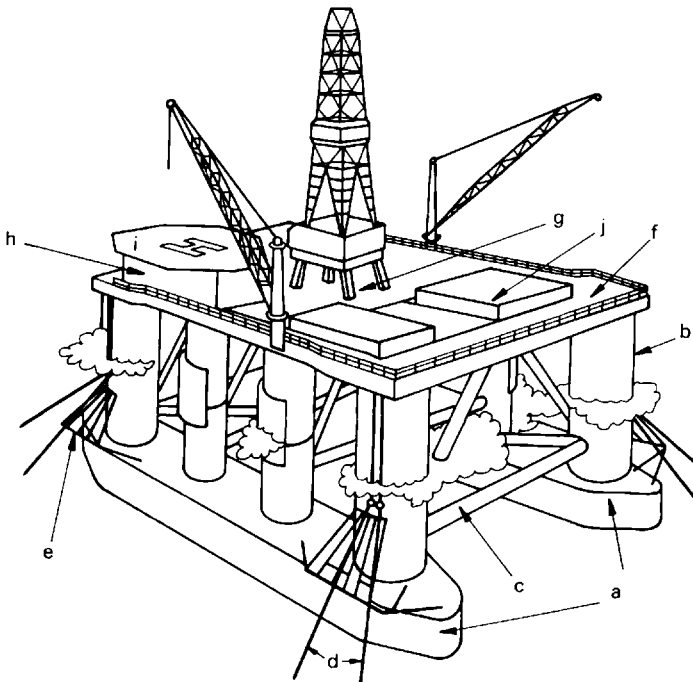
Typical semisubmersible vessel. Key: a – submerged pontoons; b – surface piercing deck support column; c – bracing members; d – mooring lines; e – anchor racks; f – deck structure; g – moonpool; h – accommodation; i – helicopter pad; j – drill pipe racks
